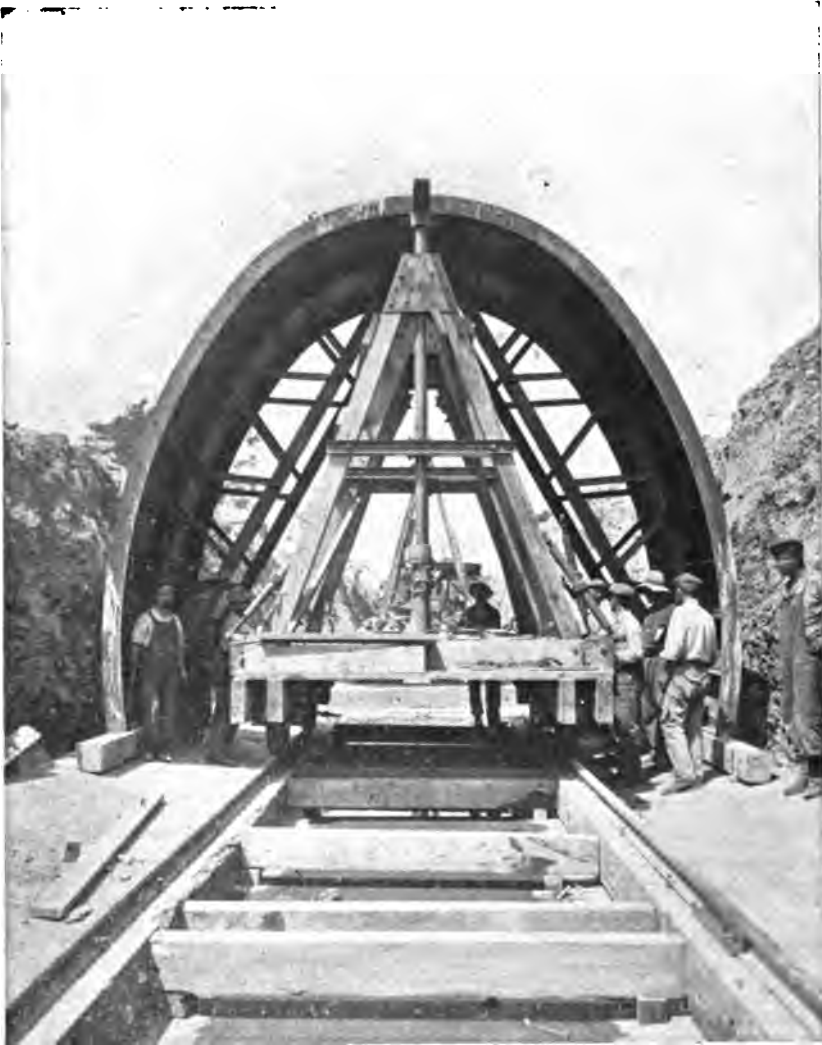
Contract 16. Steel Form—King, Rice & Ganey. Form has only One Joint, at Crown, and was Easily Moved by Carriage Shown. Hydraulic jacks raised and lowered forms, sides were pulled in by ratchet-jacks on side. Form was non-telescoping and very successful for “spacing out” method of building cut-and-cover aqueduct.
